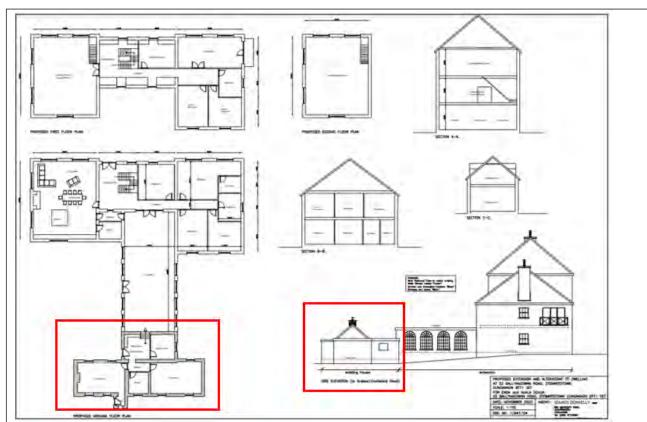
Proposed floor plans and west side elevation of the resultant dwelling with the existing dwelling identified by red box.
